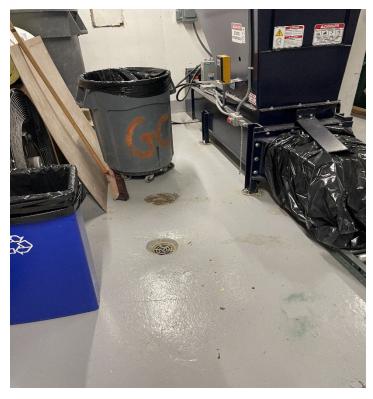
Photo of the concrete slab in the garbage room of the Site's cellar.
